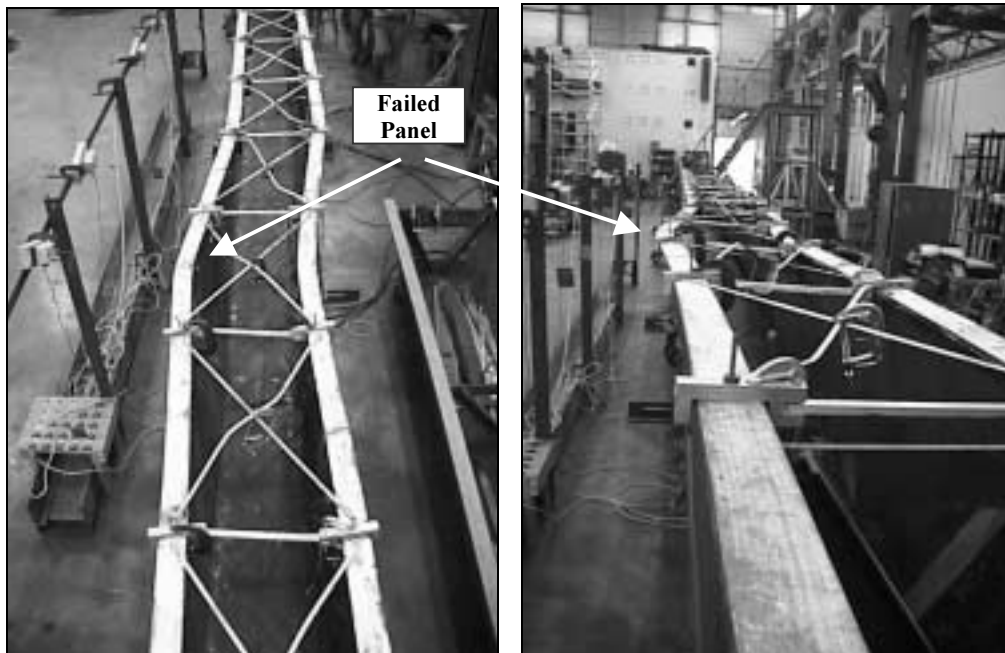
Girder after Reaching Failure Mechanism
